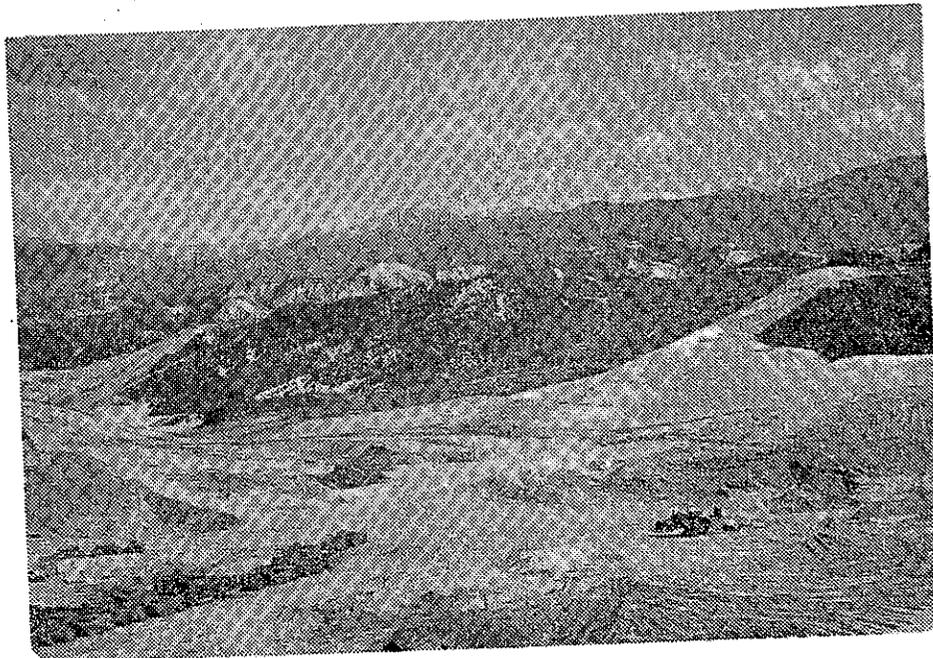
Looking northeasterly at typical scale of earthworks on Route 14.
